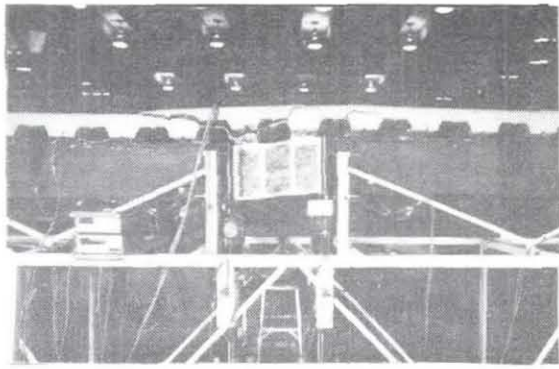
Floor Slab Damage, Specimen C1.
